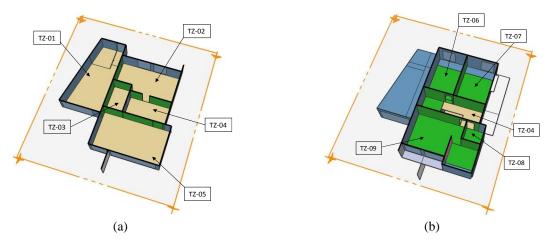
Layout of the indoor spaces: (a) ground floor; (b) first floor. TZ-01 Garage; TZ-02 Kitchen; TZ-03 Bathroom; TZ-04 Hall; TZ-05 Living Room; TZ-06 Bedroom; TZ-07 Bedroom; TZ-08 Bathroom; TZ-09 Bedroom
